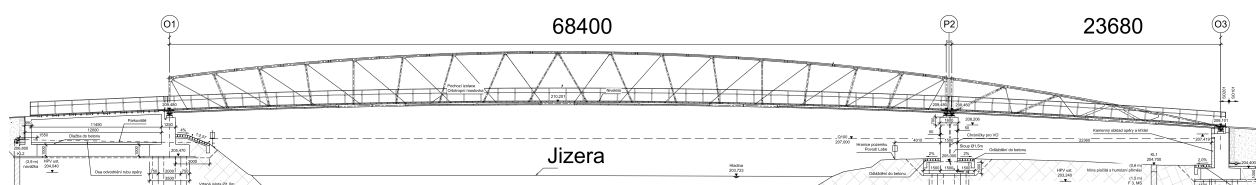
A longitudinal section of the investigated footbridge structure [10].
